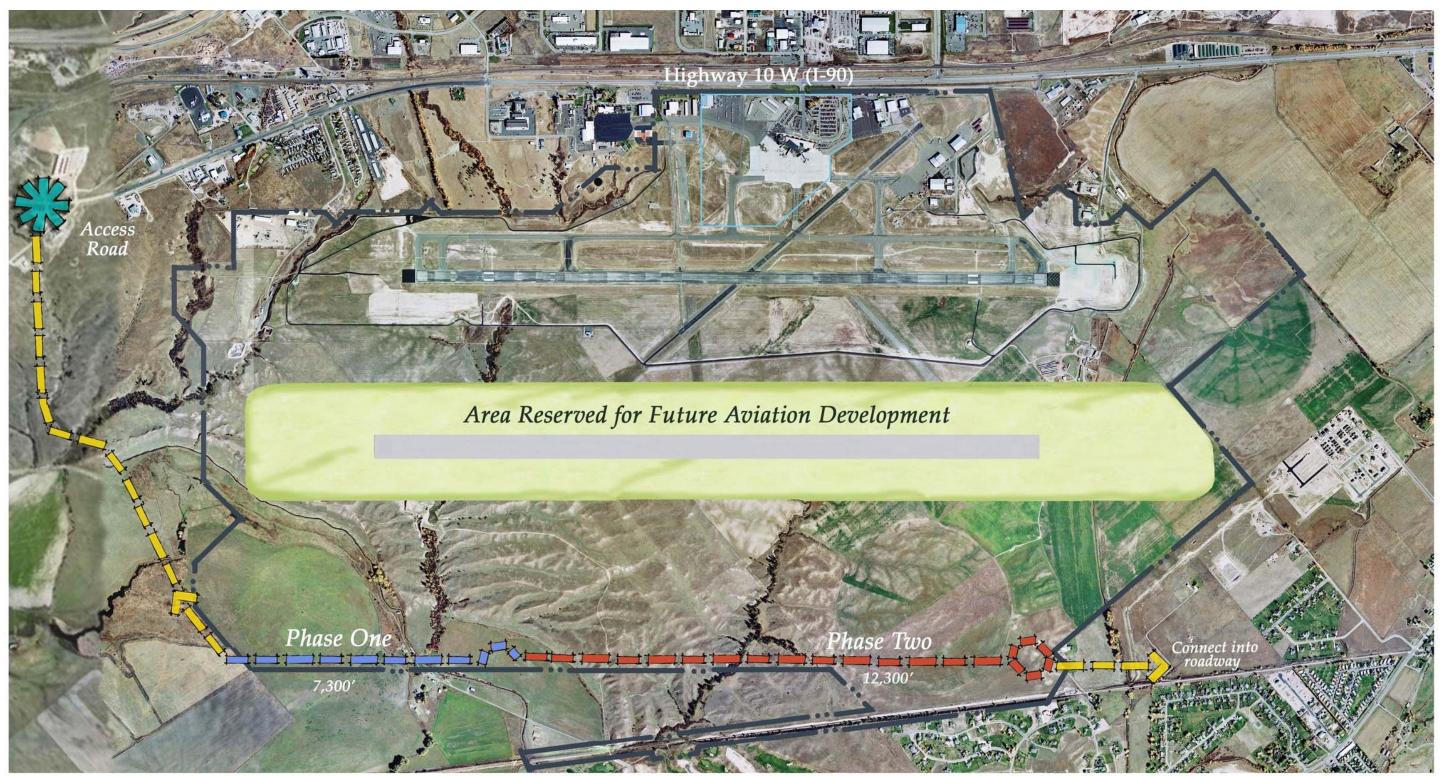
Conceptual Plan 3 Access Road Alternative
